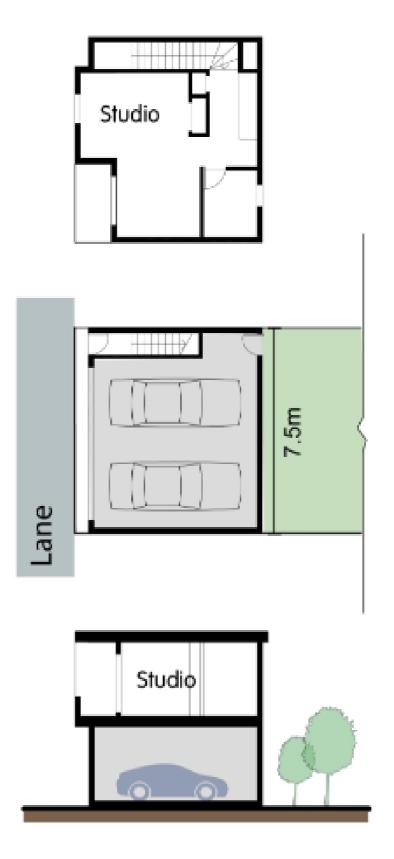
Typical Studio Dwelling Typology with Two Parking for Terrace Only
